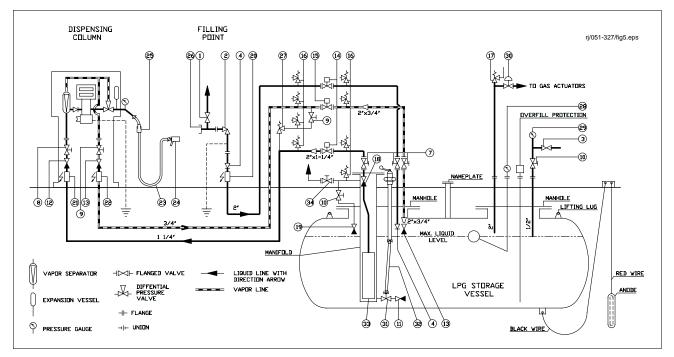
Typical scheme for an underground LPG storage tank with vertical submersible pump
